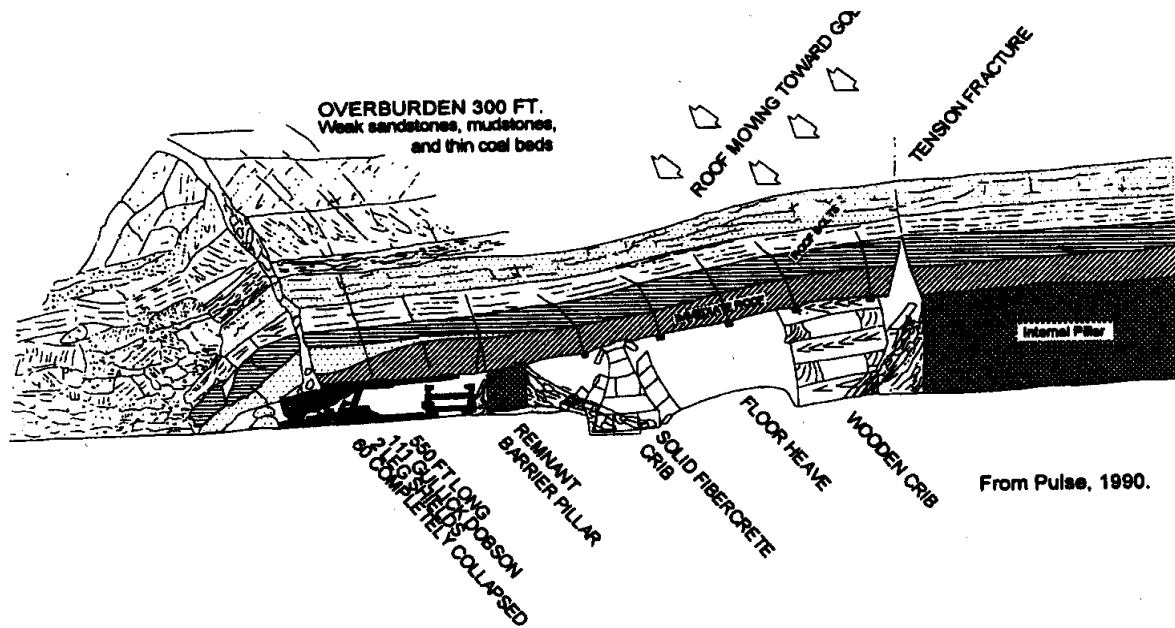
Typical physical behavior of a pre-driven room under weighting type roof failure. From underground observation of an actual recovery room failure. Note the fracture observed to develop at the front edge of the abutment pillar.
